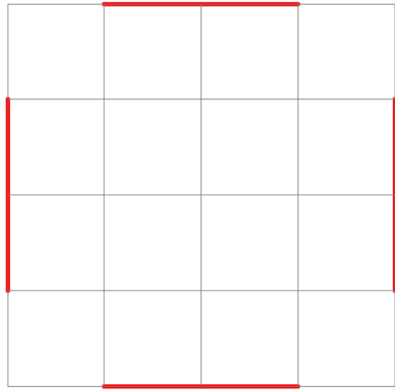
(a) Structural Plan for Inverted V-braced RC Frame (Model-4)
